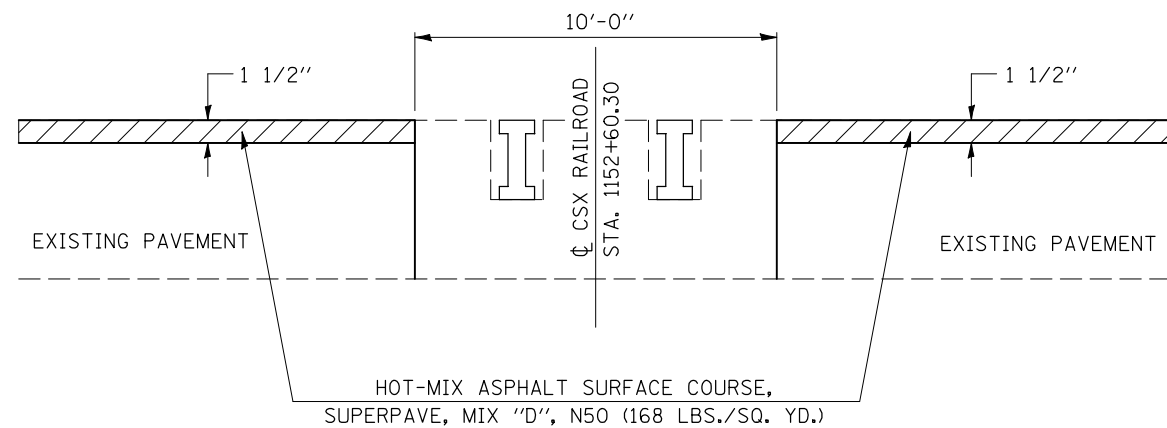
DETAIL OF URBAN HMA SURFACE REMOVAL (COLD MILL), SPECIAL
